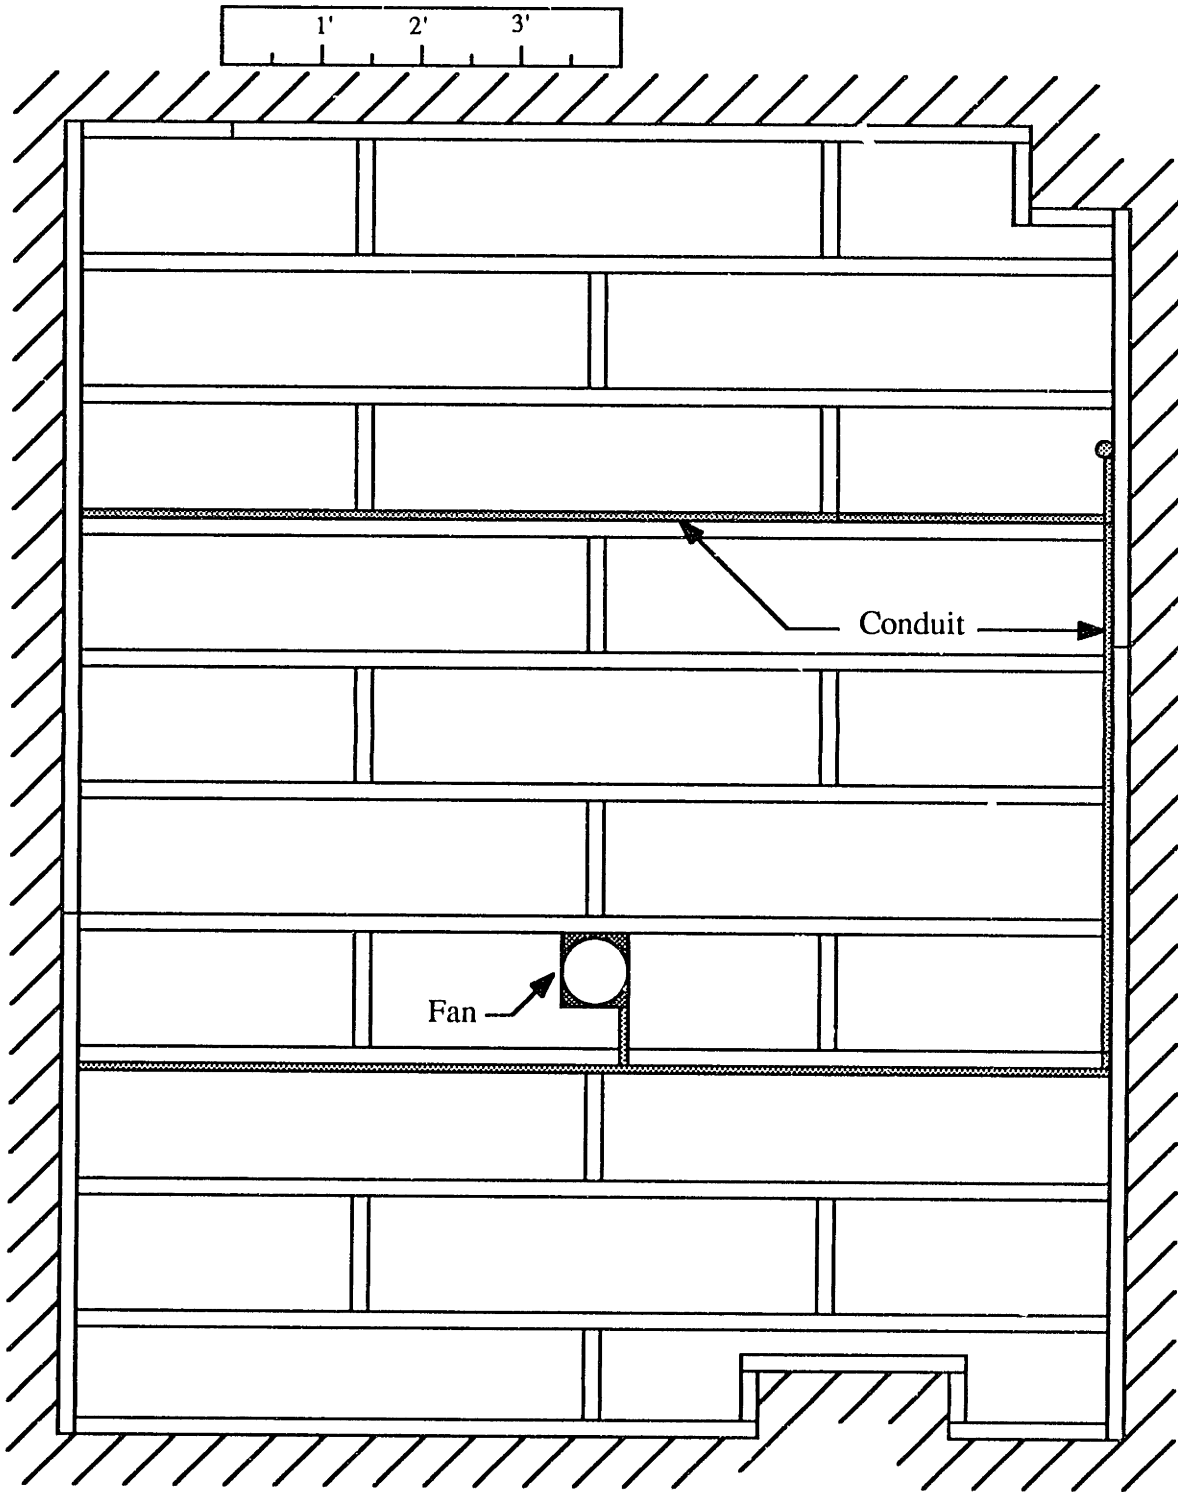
Ceiling Frame made of 2x4's. Shows possible Conduit Orientation and fan location.
